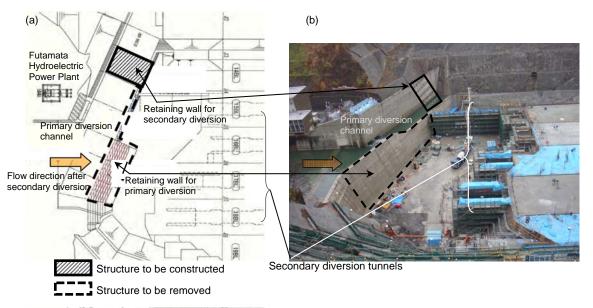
Layout (a) and construction (b) of the retaining walls for the primary and secondary diversions.
